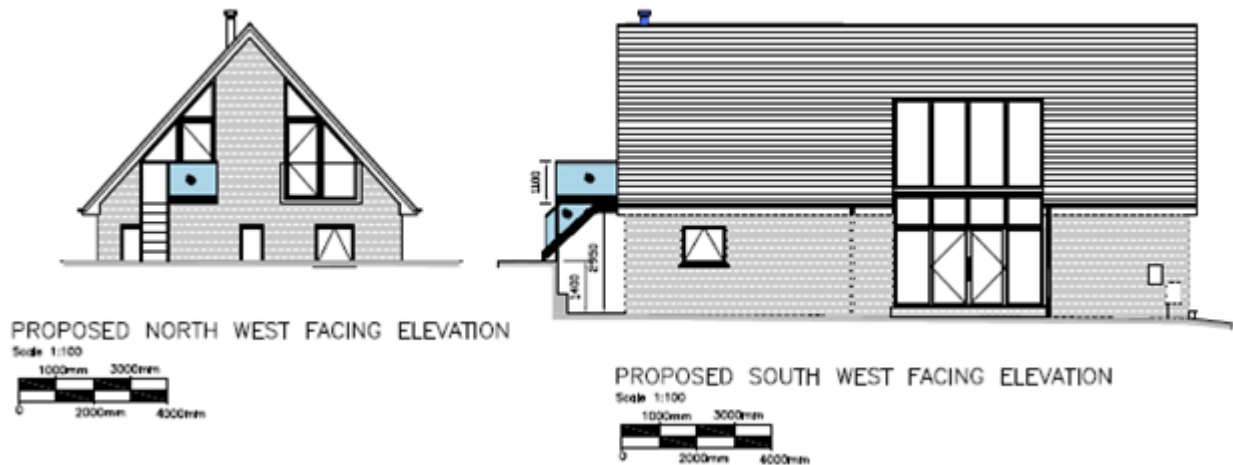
extract from approved drawing No: TS9185/01 Rev A, received on 6th September 2022 pursuant to planning application 10/22/0885 – proposed rear and side elevations.
